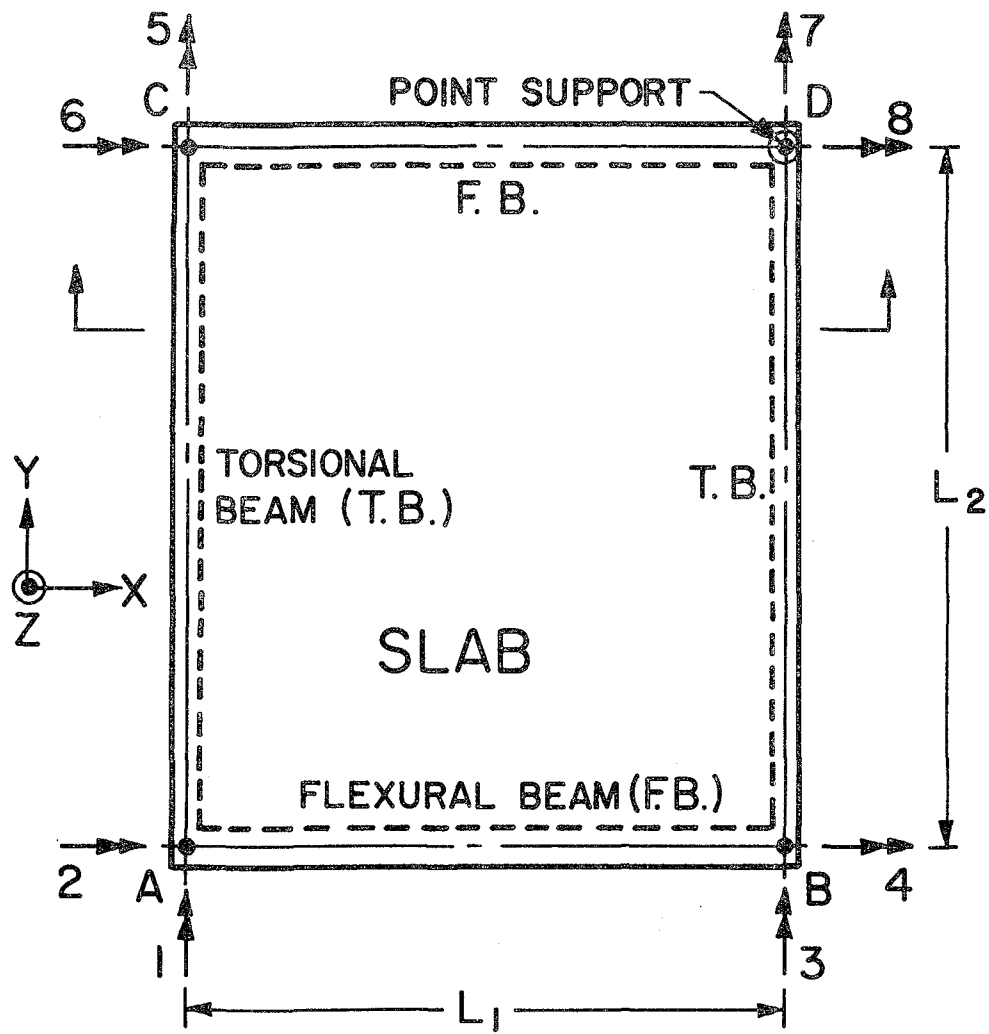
Single-Panel Floor with Eccentric Beams
